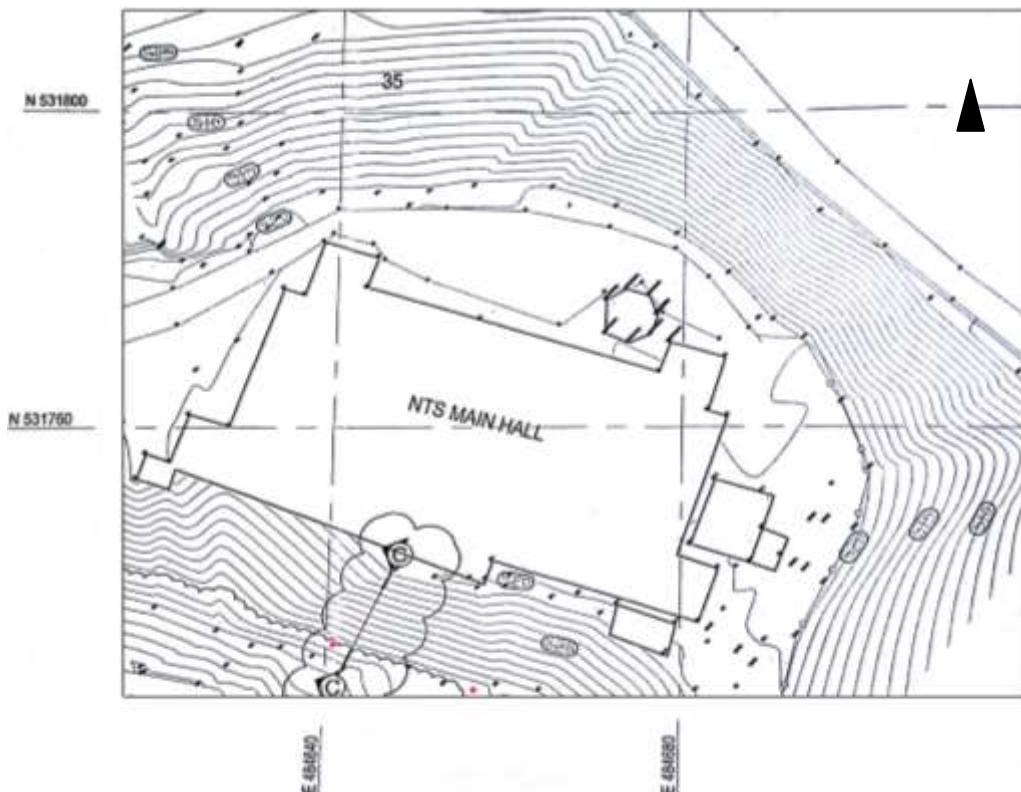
Soil nail wall construction site near to the Nursing Training school (NTS) at Kandy. (Not to scale)
